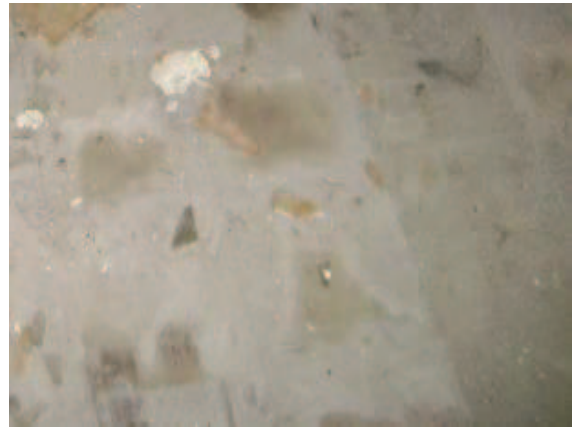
HA #7- Brown 9x9 Floor tile under Carpet
